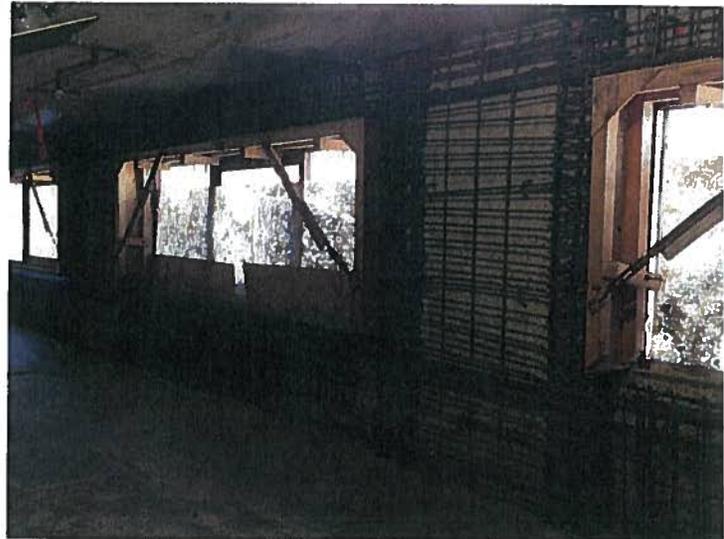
Addition of steel reinforcement to dowels for wall seismic strengthening on Level 4.
